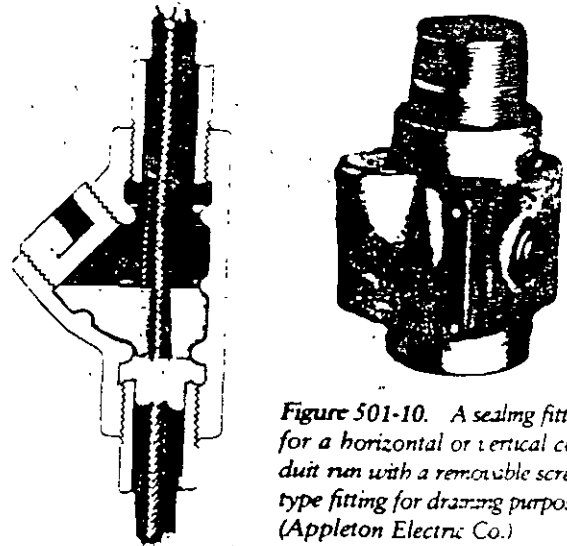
A sealing fitting for a horizontal or vertical conduit run with a removable screw-type fitting for drawing purposes. (Appleton Electric Co.)
